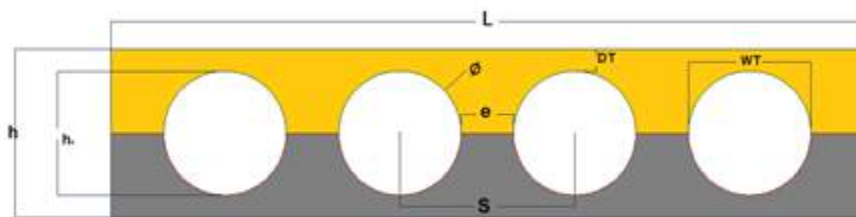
Design of Castellated Beams with a Circular Opening.
